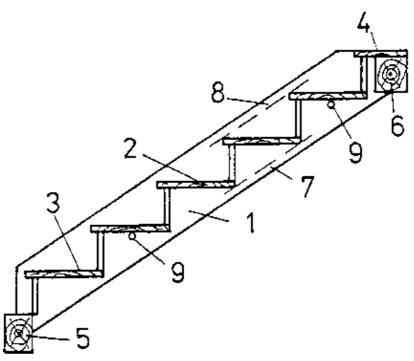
Sectional view of mortised stairs – 1 stair string, 2 step, 3 stair foot (bottom step), 4 stair head (head step), 5 lower (bottom) stair–apron, 6 upper (top) stair–apron, 7 string bottom, 8 string top, 9 screw rod
